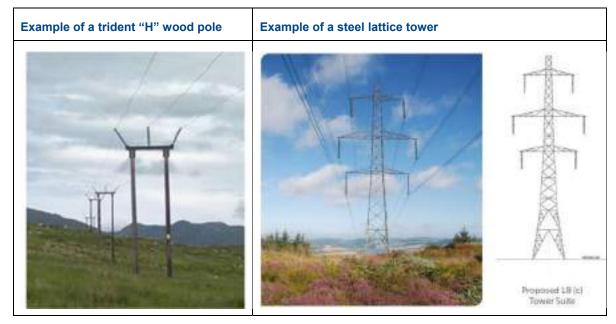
'H' Wood Pole and Steel Lattice Tower examples
